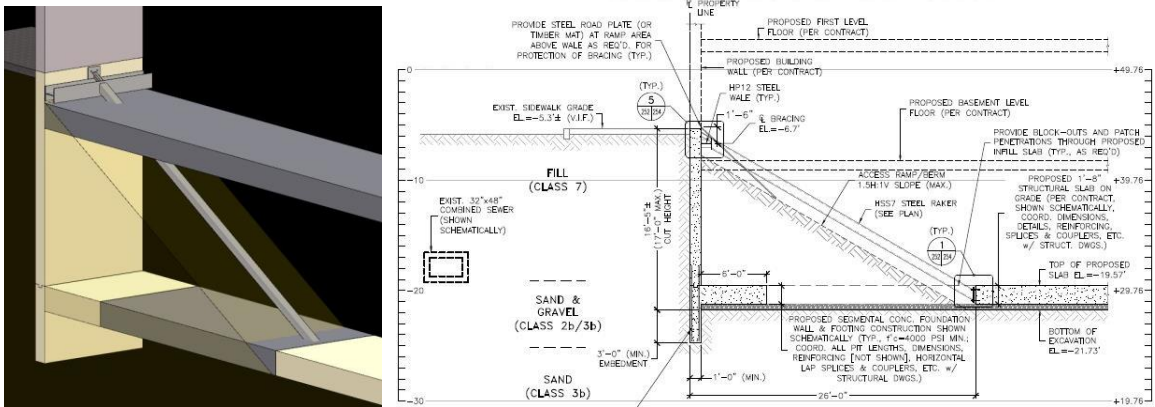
1954 Classroom Addition Proposed Townhouse Segmental Wall Section
